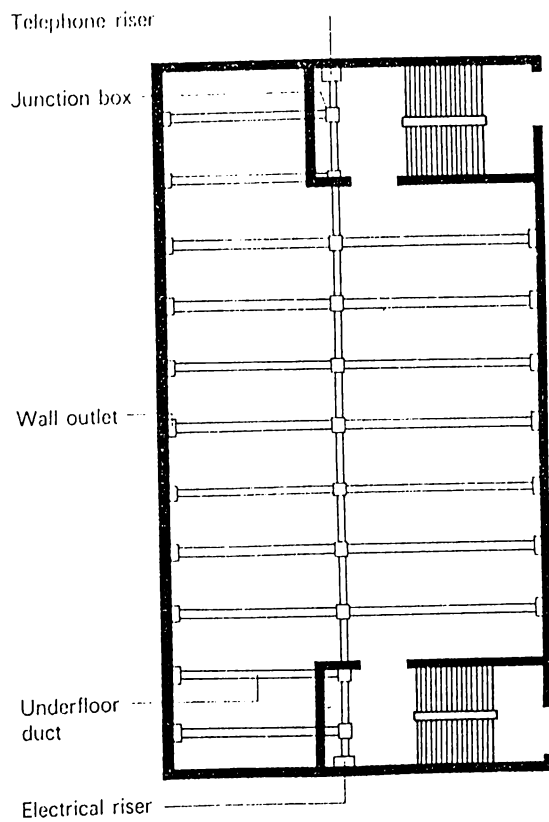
Branching Layout for Partitioned or Open-Plan Office (Hall, 1990)
